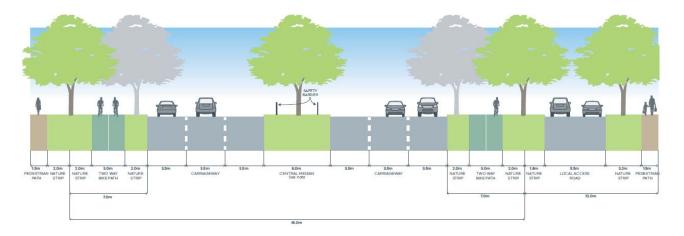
Secondary Arterial Cross-Section (Grices Road)
